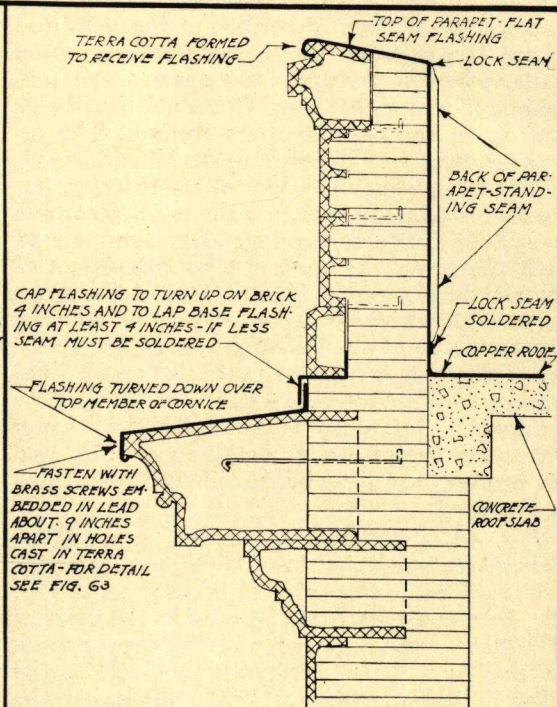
A Terra Cotta cornice surmounted by a brick parapet-wall faced by Terra Cotta and the method of flashing same is shown in Fig. 60. In this type of construction it is important that the entire top and back of the wall be covered with copper. This will prevent the absorption of moisture by the masonry through the joints of the Terra Cotta and brick work and permit cutting down the width of the Terra Cotta cap. In designing the Terra Cotta cap the upper part of the cap should be made with a roll, as indicated, from 1 to $1\frac{1}{2}$ inches in diameter. The copper is formed over this roll and extended over the top of the cap and down on the inside of the parapet-wall where it is connected to the copper roof by a soldered
